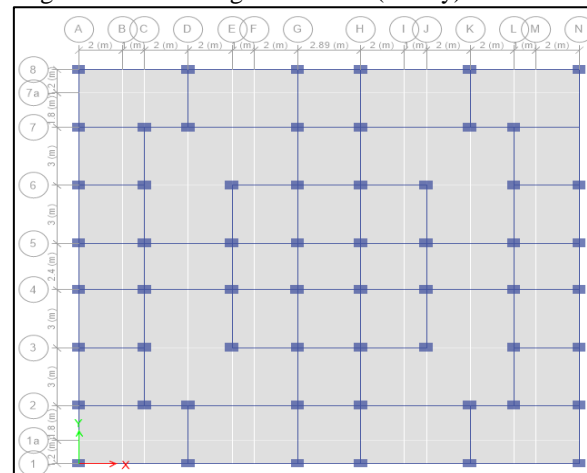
Plan Showing 11th Floor Level (Storey) In ETABS
